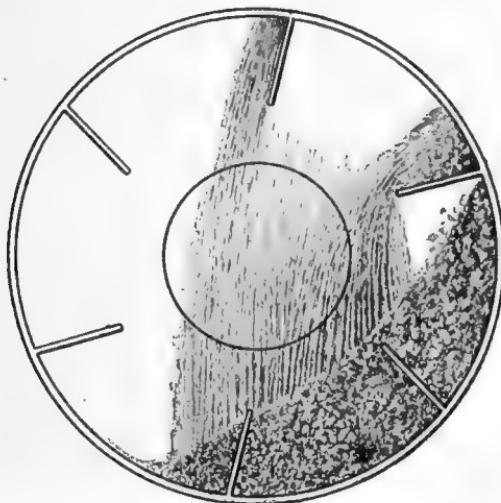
A RANSOME CONCRETE MIXER AT WORK.
